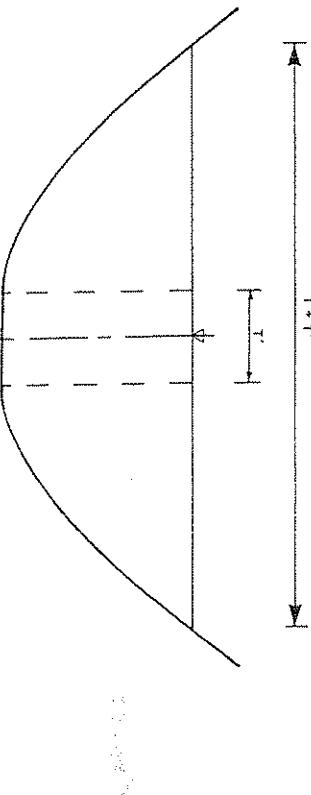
Definition sketch for stable hydraulic section when $Q > Q_D$.
